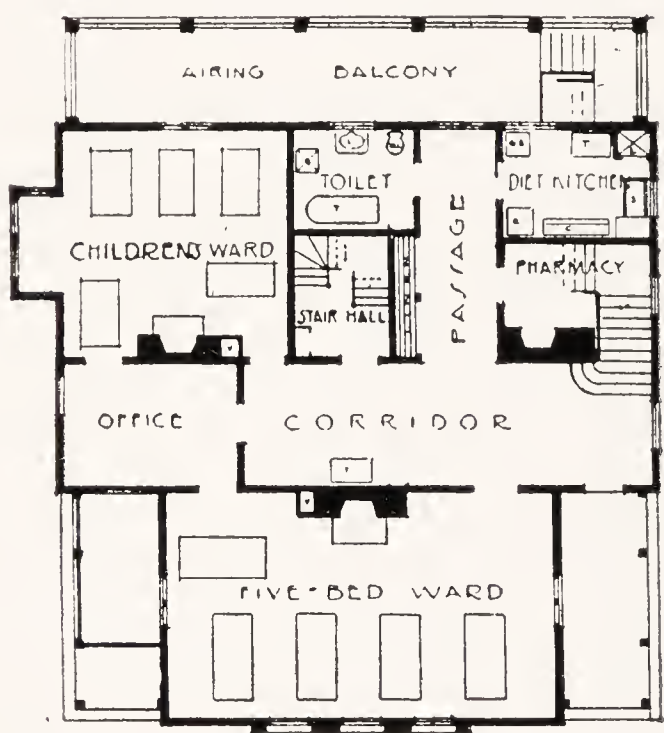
FIRST FLOOR AFTER FIRST REMODELING
